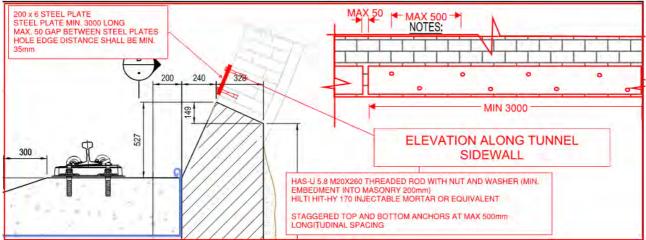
MASONRY WALL EDGE TEMPORARY SUPPORT - STEEL RIBBON TO MAINTAIN STRUCTURAL INTEGRITY OF THE MASONRY (SOURCE: AURECON/VLINE)
